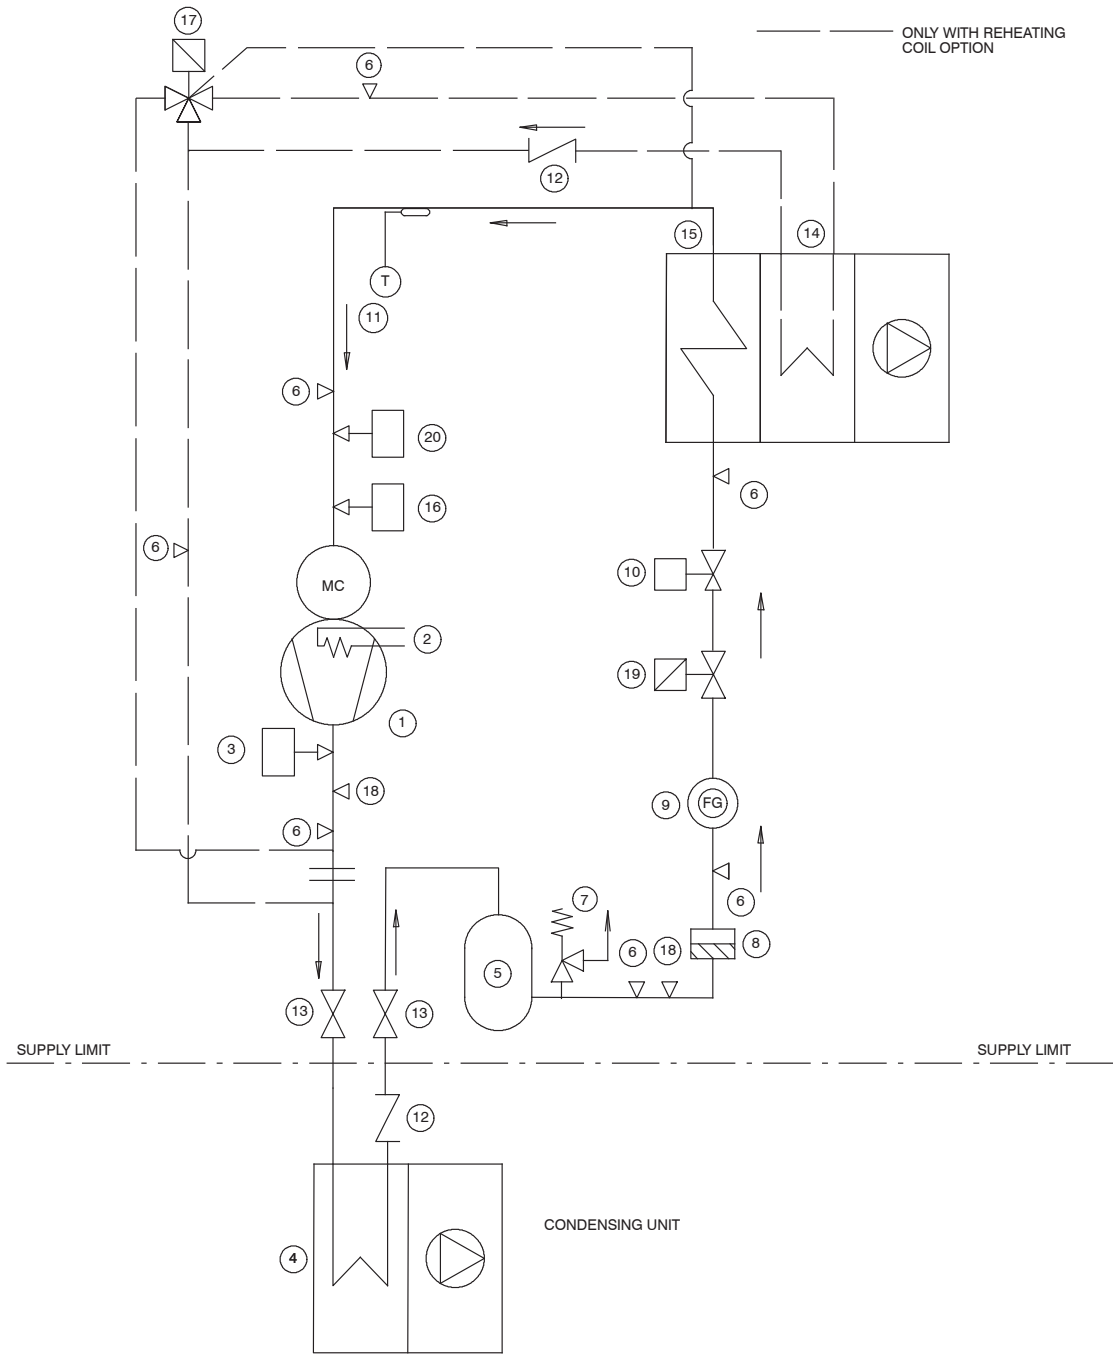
Refrigerant circuit A version - Single circuit - Single SCROLL compressor - TXV
